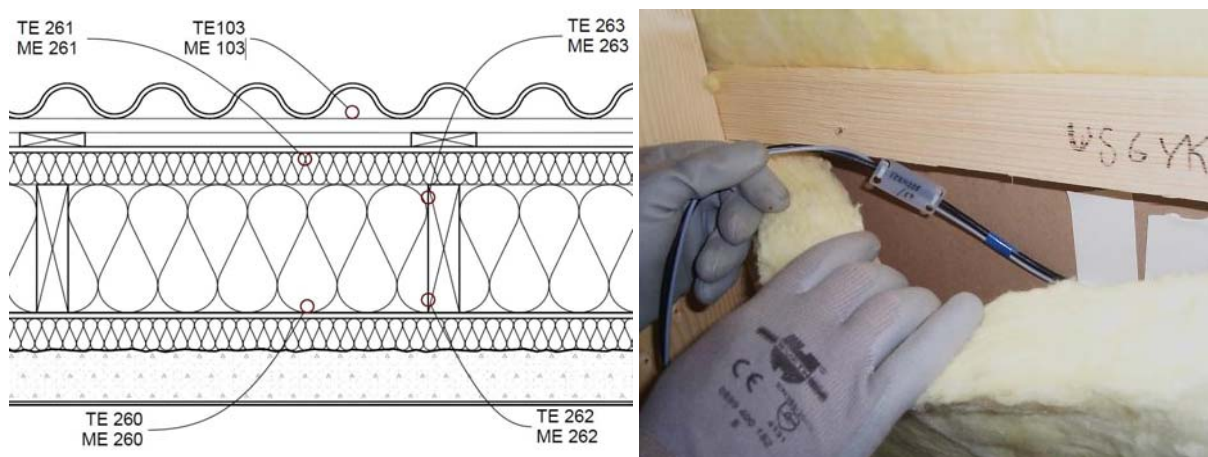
Monitoring positions of the Oulu TES facade element at location US10YK.
